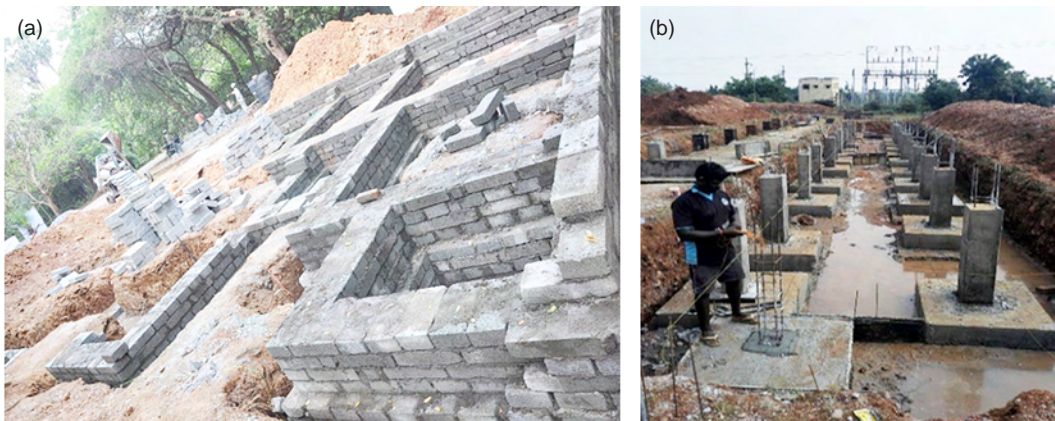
(a) Block work using fly ash blocks on strip footing and (b) pedestals on isolated footing
